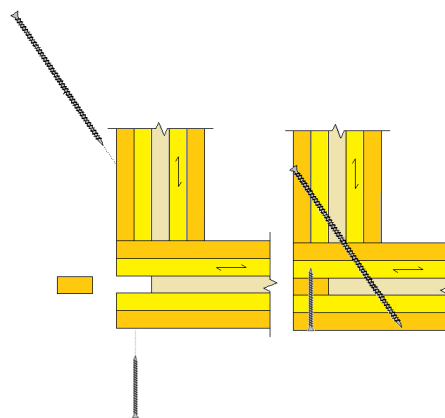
Screws driven in angle solution for corner wall-to-wall or wall-to-floor connections.
